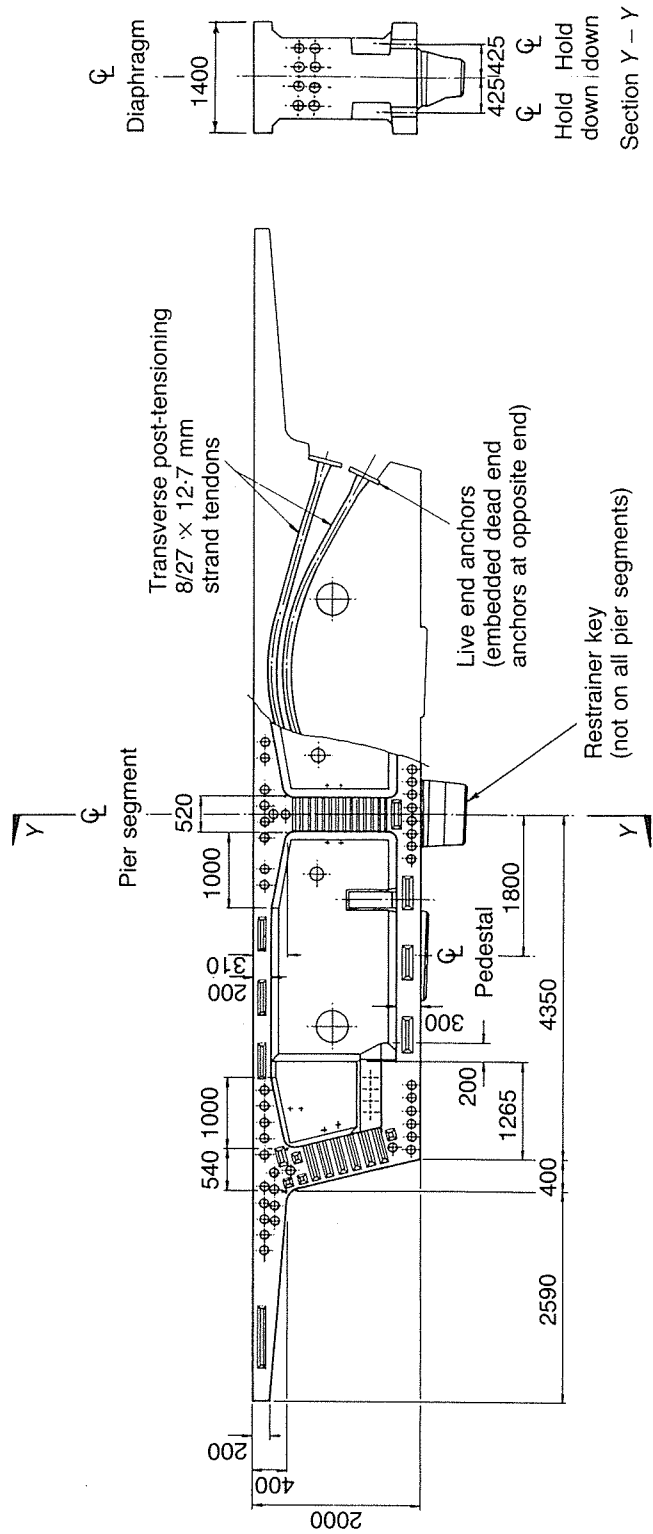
Twin cell pier segment (540 mm/520 mm web dimensions)
